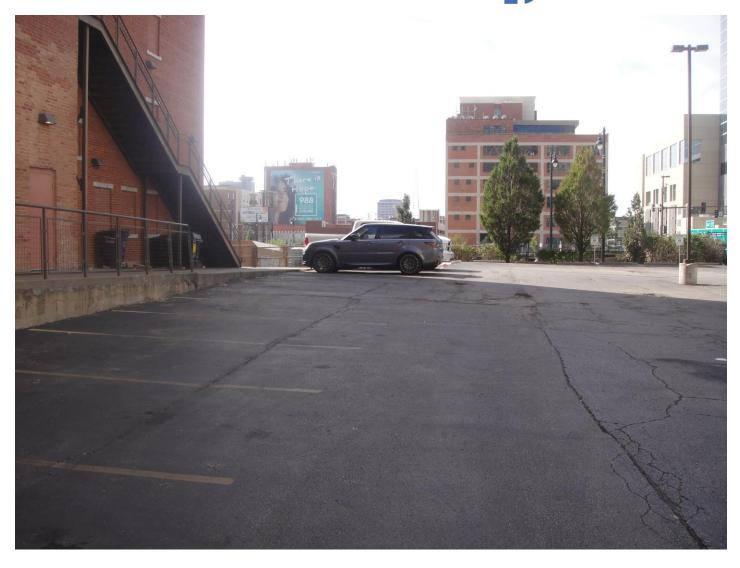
Block 138. View south of eastern boundary. New structure at this location would abut the theater structure to the left.
